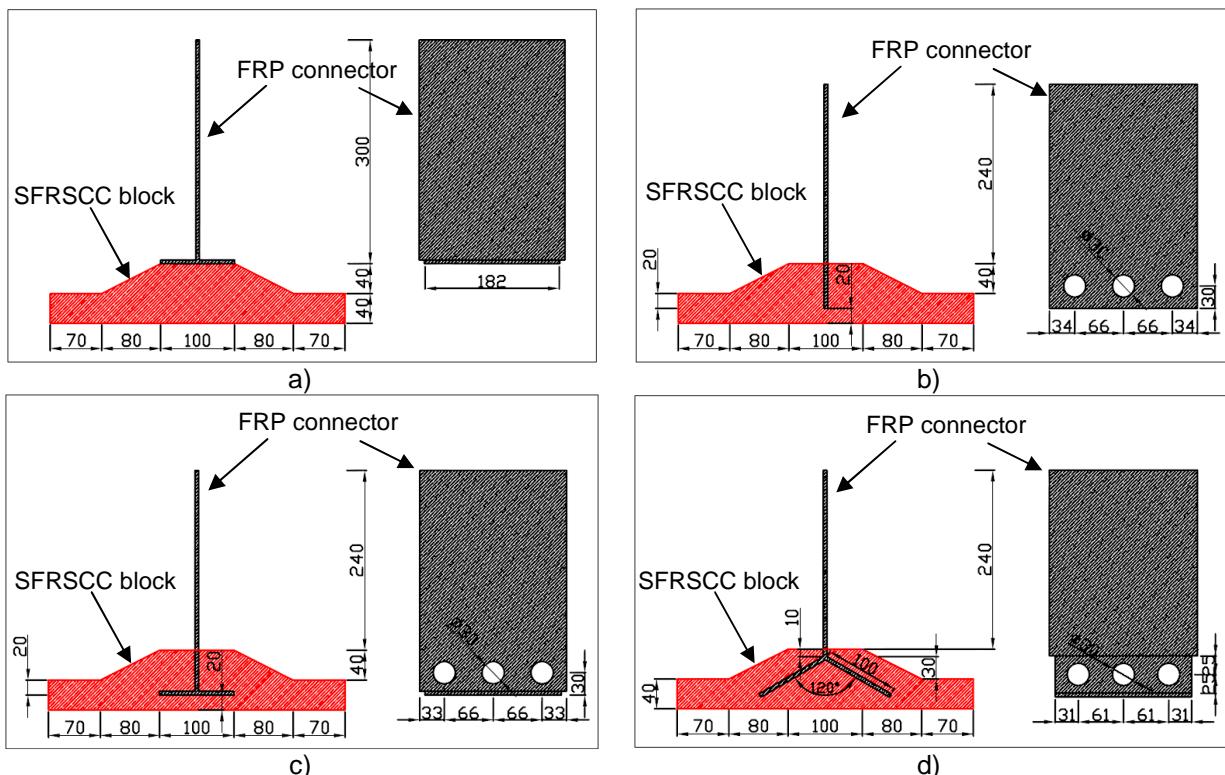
Details of pull-out specimens: a) adhesively bonded – type C, b) embedded – type L, c) embedded – type T, d) embedded – type Y. (dimensions in mm)
